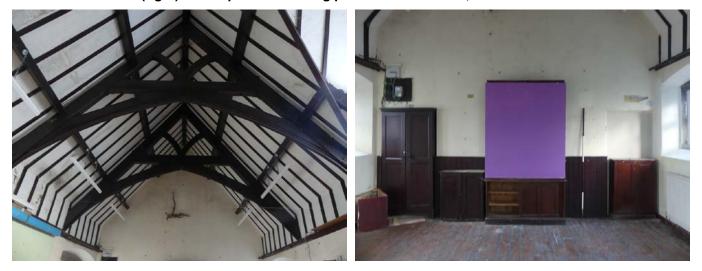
(left): Trusses at the north end of Room G1, viewed from the south
